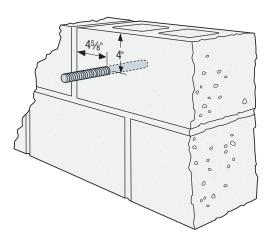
Anchor Installed in Face Shell with Screen Tube in Hollow Cell
